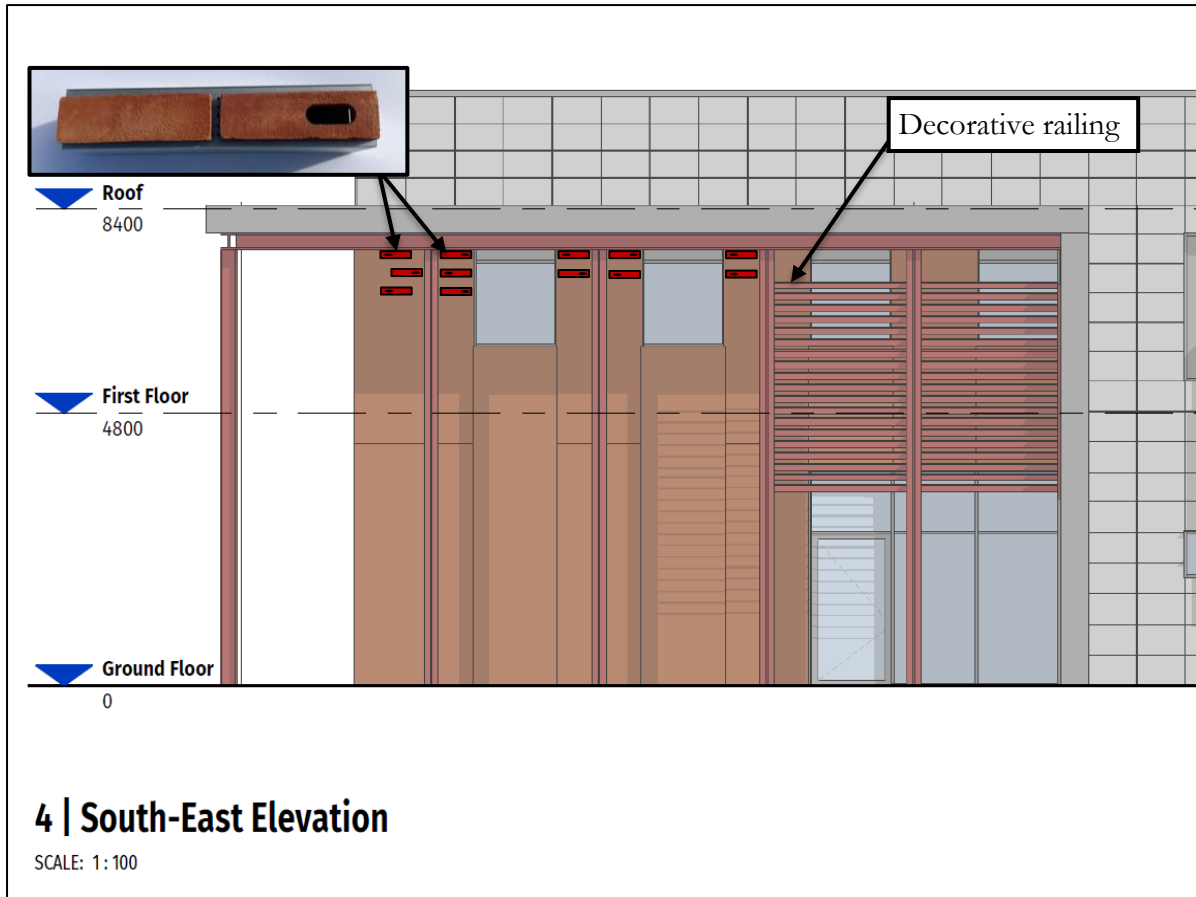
Indicative placement of twelve Swift “S-bricks” shown on an extract of the “Proposed Side Elevations” plan created by DB3 Group on 04.02.2026
